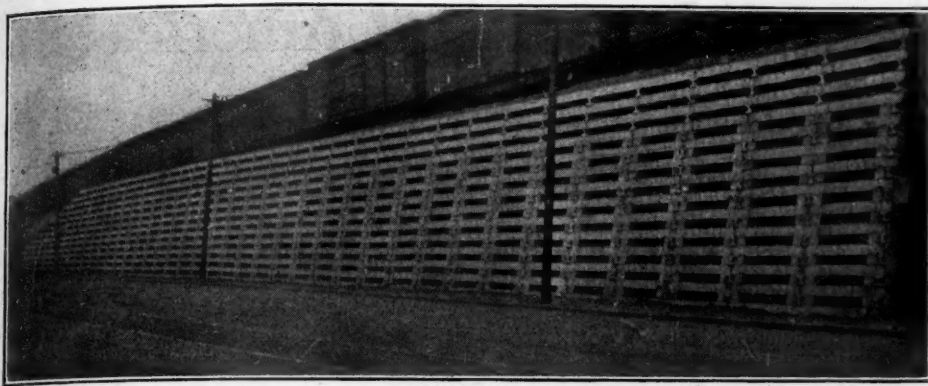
TEMPORARY SECTIONAL CONCRETE RETAINING WALL
